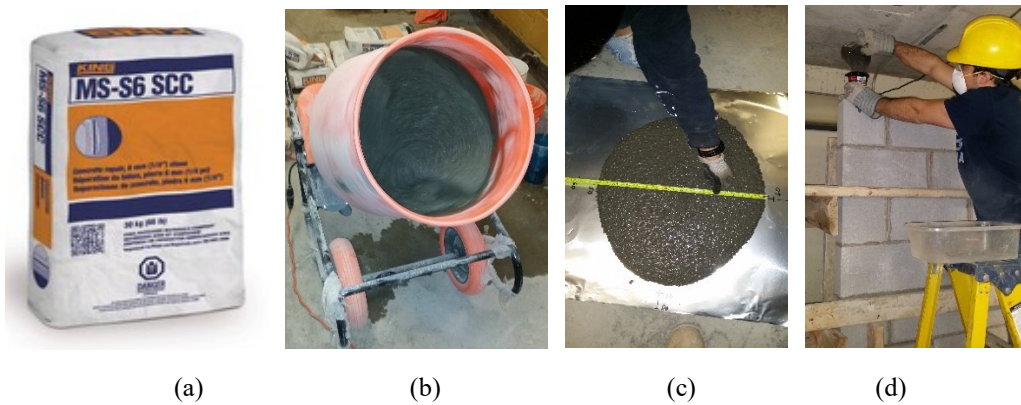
Pouring SCC in voids of two CMU walls; (a) SCC bag, (b) SCC mixture (c) slump flow test, (d) SCC casting
